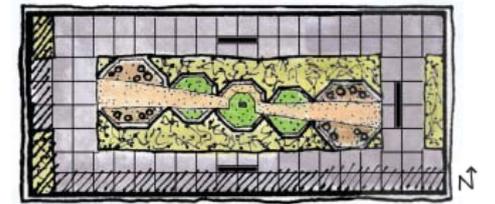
Enlarged Plan of Courtyard Space. Not to Scale. Plan by Author
